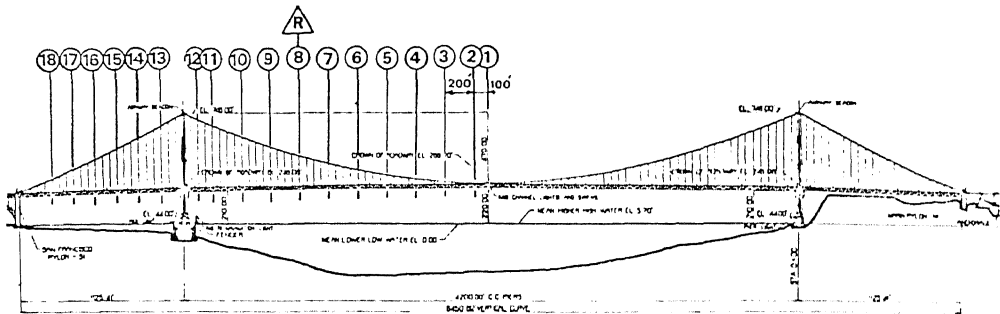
ELEVATION OF GOLDEN GATE BRIDGE SHOWING SPAN MEASUREMENT LOCATIONS
